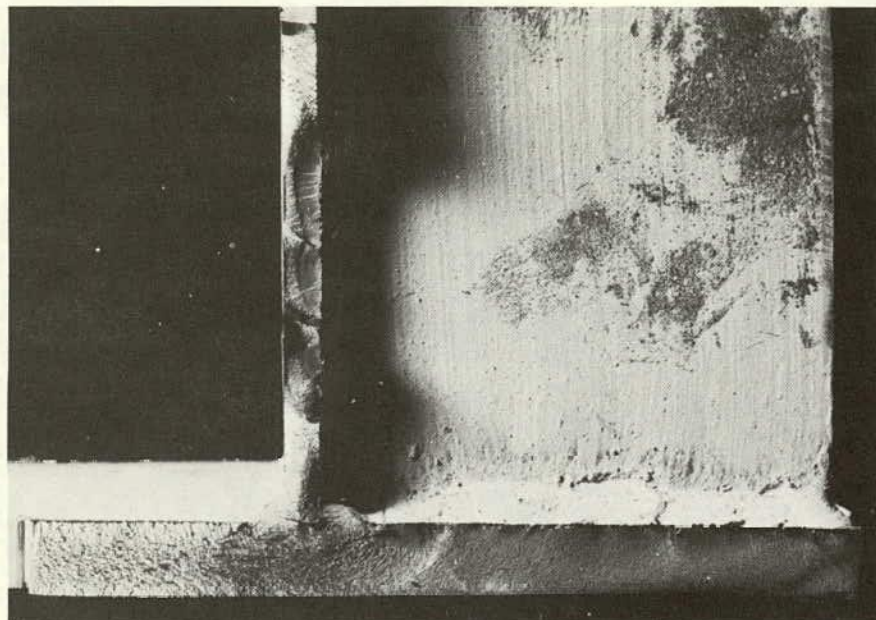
Typical fatigue crack surface at Type 3 stiffener at failure.
